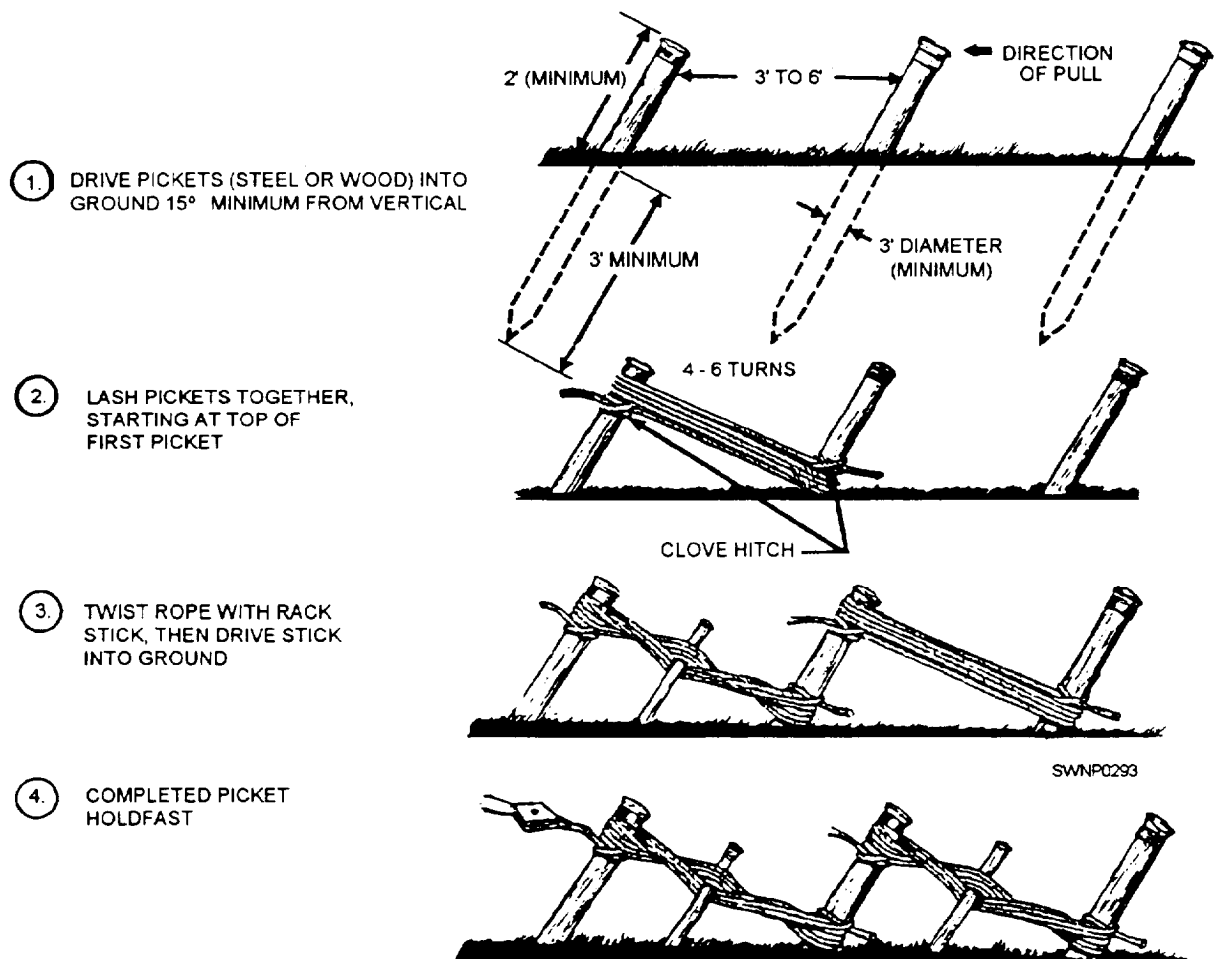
Preparing a 1-1-1 picket holdfast.
